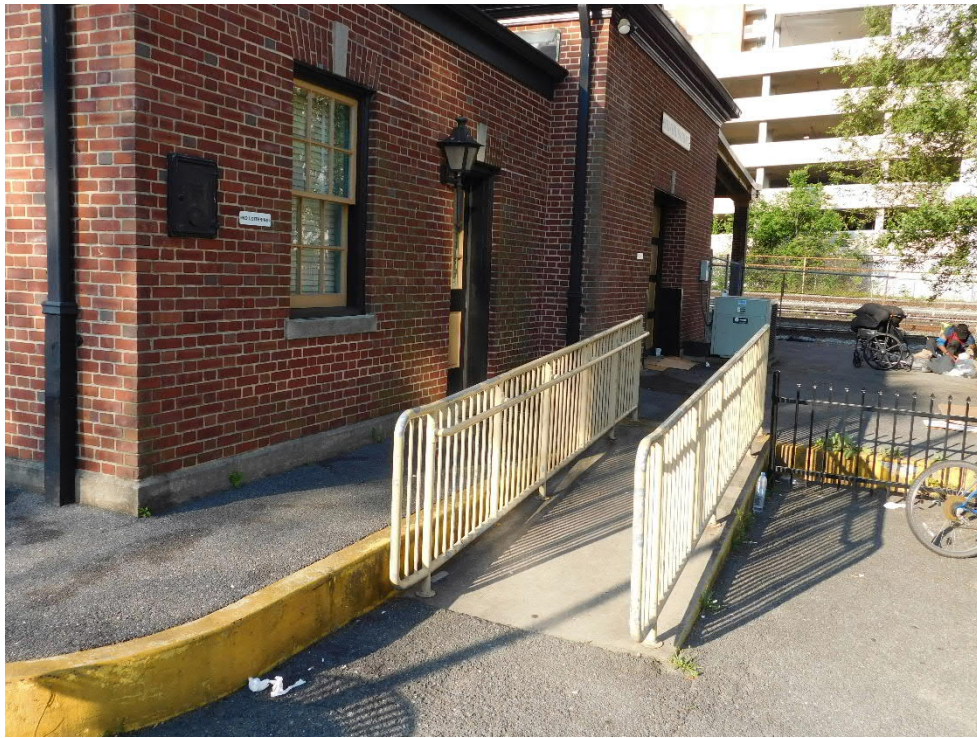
Rails and Brick pavers installed at the entrance into the B&O Station Parking Lot prior to the construction of the Progress Place
